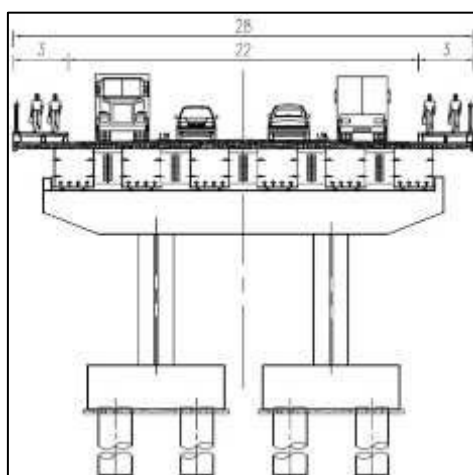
Cross-section of the Xinxing Avenue Flyover (SY)
